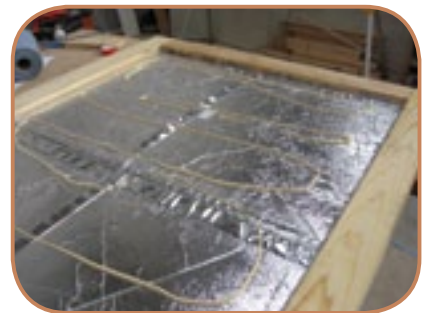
Vacuum insulated panels being incorporated into a new entrance door for a retrofit project. (Source: ECD Architects)
